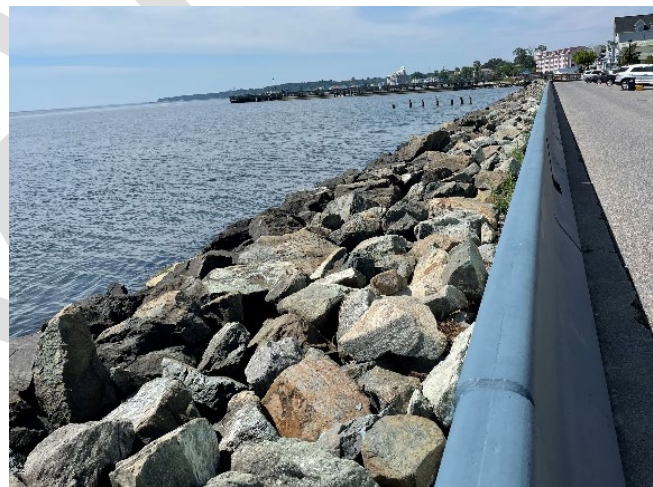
Jersey Barriers & Revetment along Atlantic Avenue
